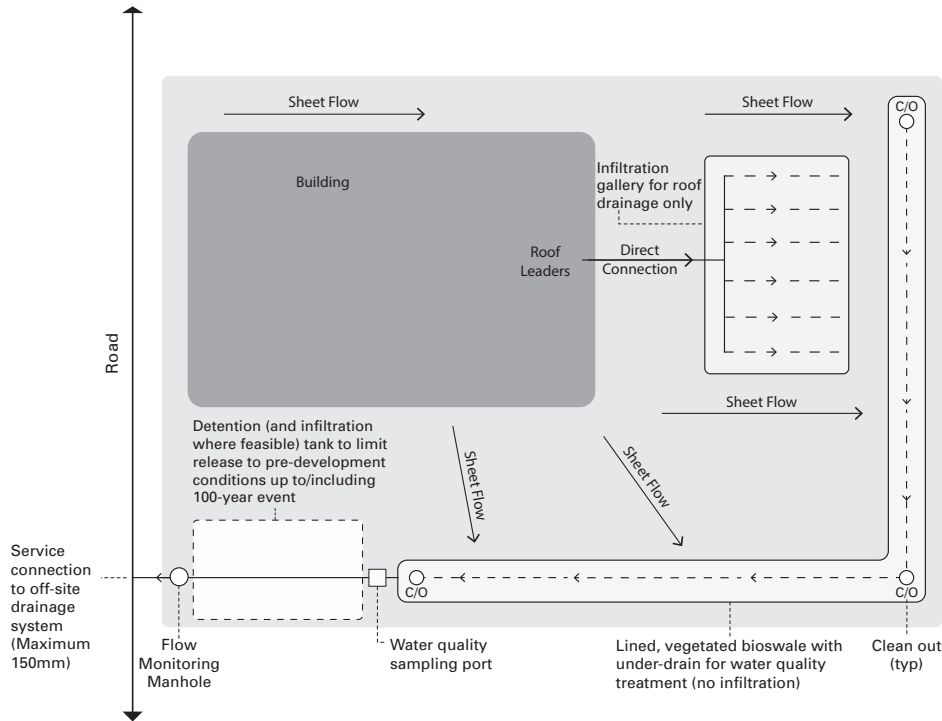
High Potential for Stormwater Infiltration: On-Site Drainage Servicing
